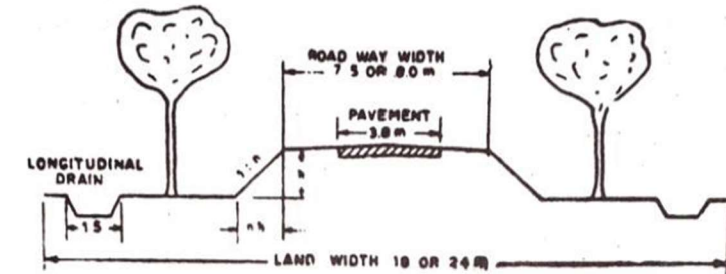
Cross Section of VR or ODR in Embankment in Rural Area
